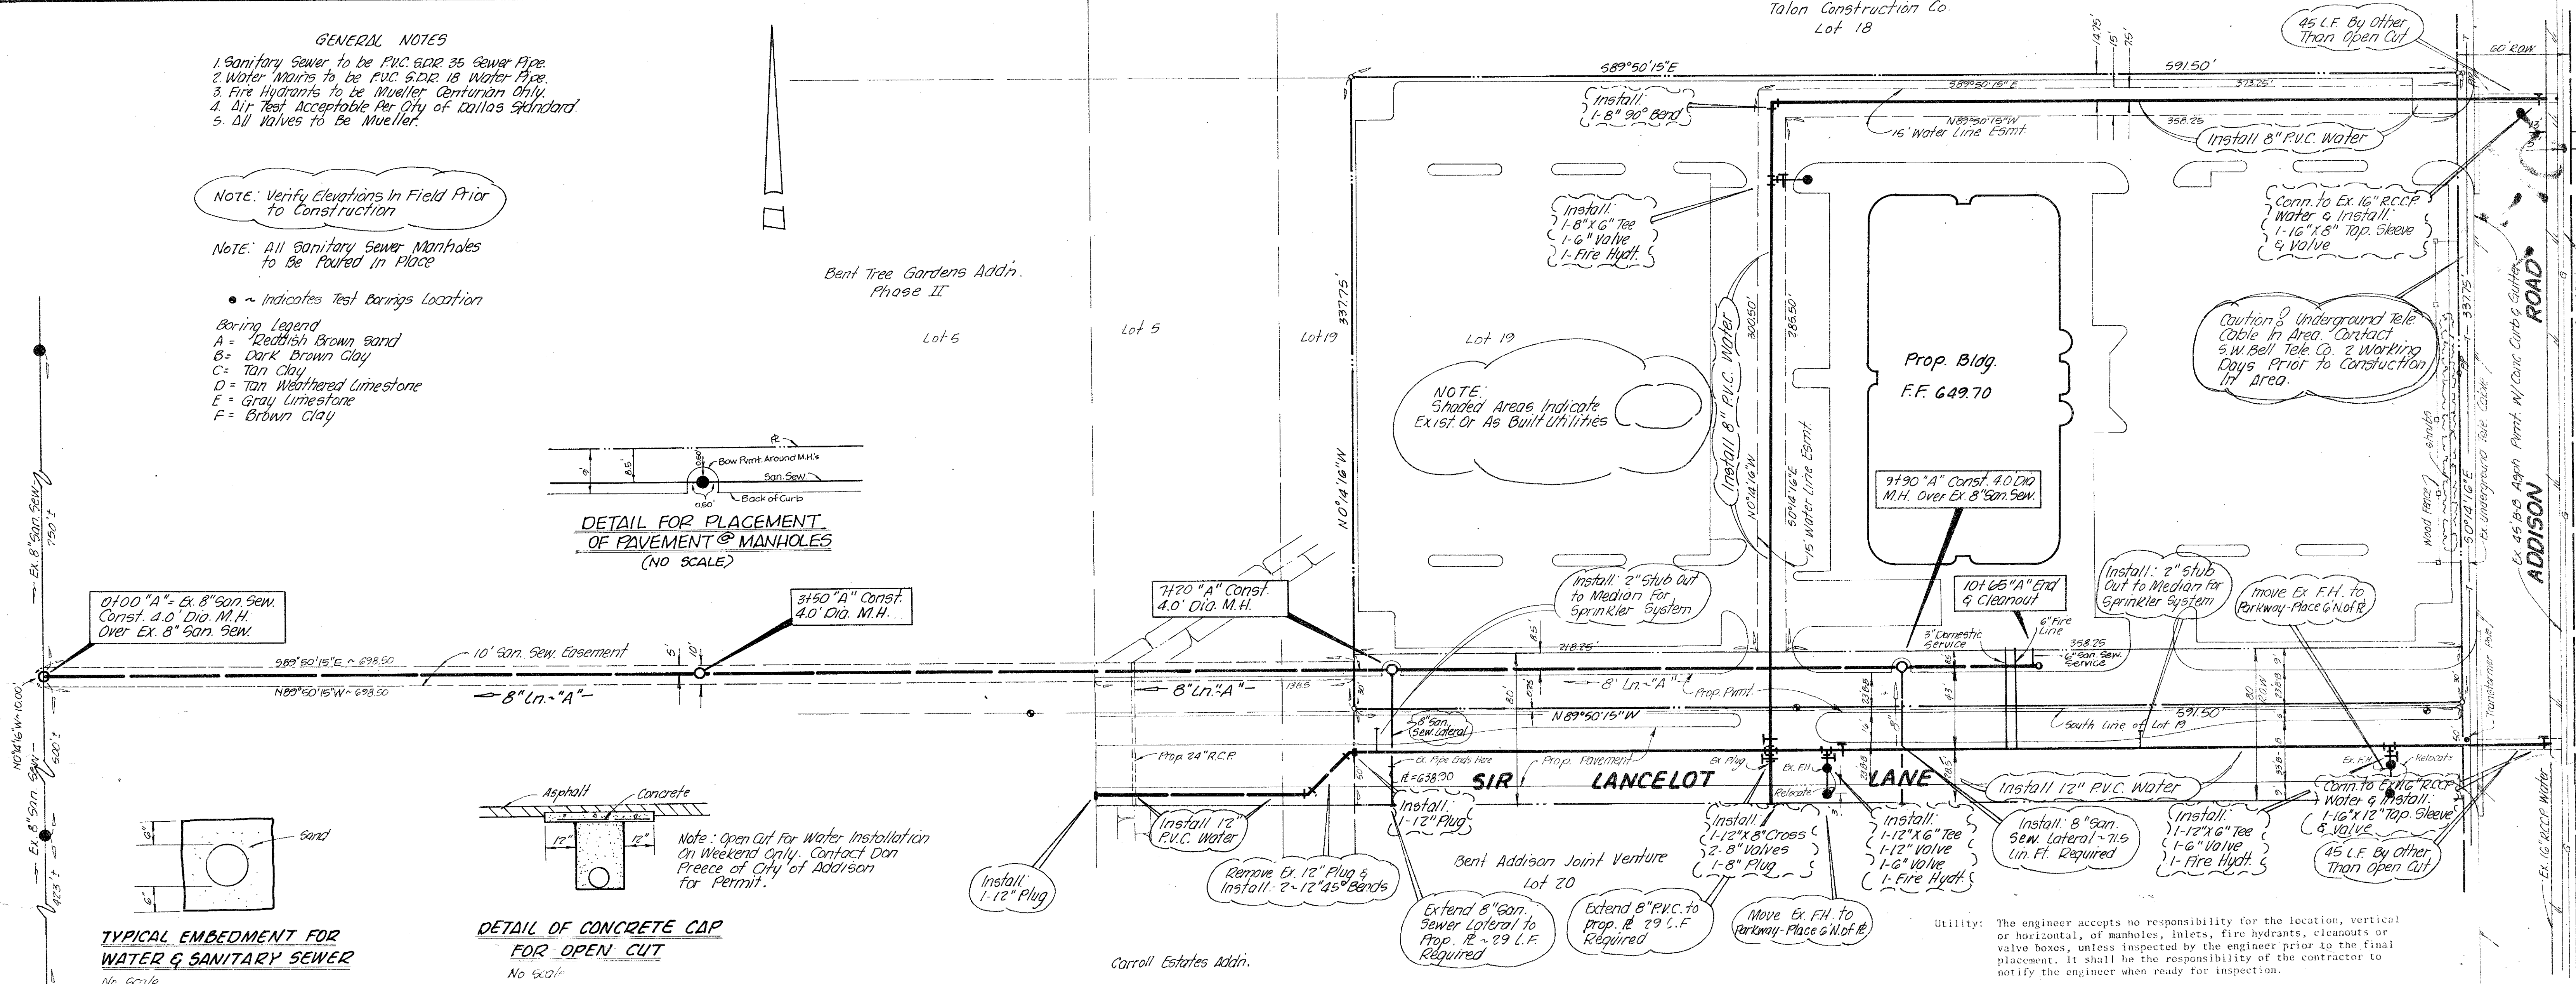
DETAIL OF CONCRETE CAP FOR OPEN CUT (NO SCALE)
